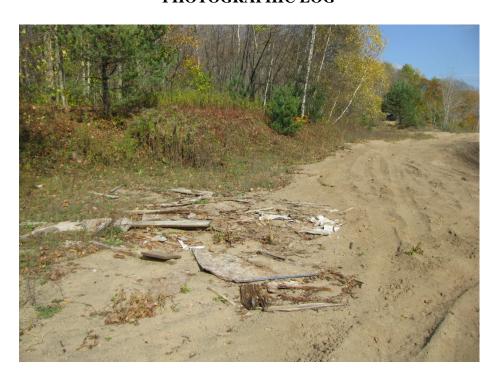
10/18/12 Construction and demolition debris being discarded west of landfill/site.
